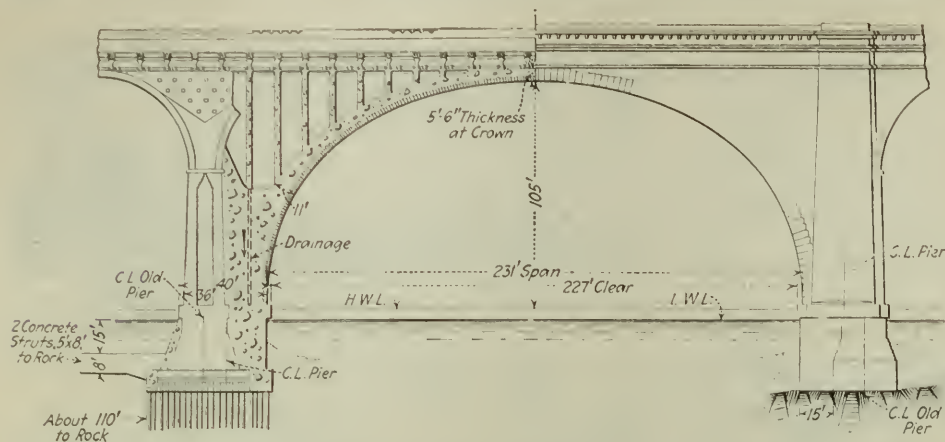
CONSTRUCTION OF LARGE ARCH FOR HIGH BRIDGE CROSSING OVER HARLEM RIVER
